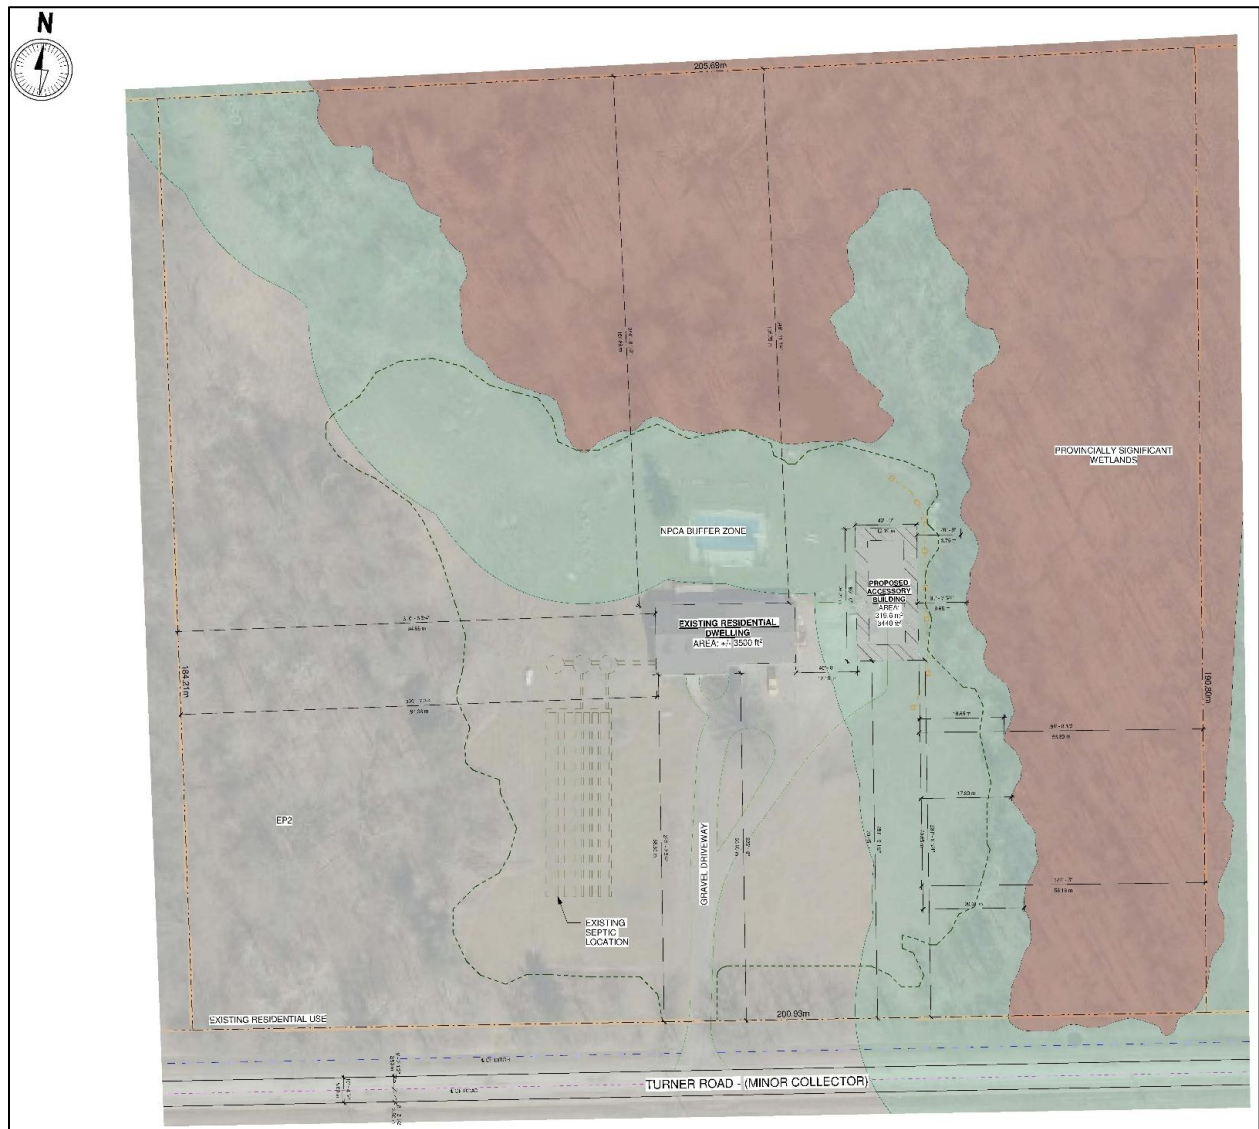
Site plan of the proposed accessory structure by Ontario OutBuilding.
